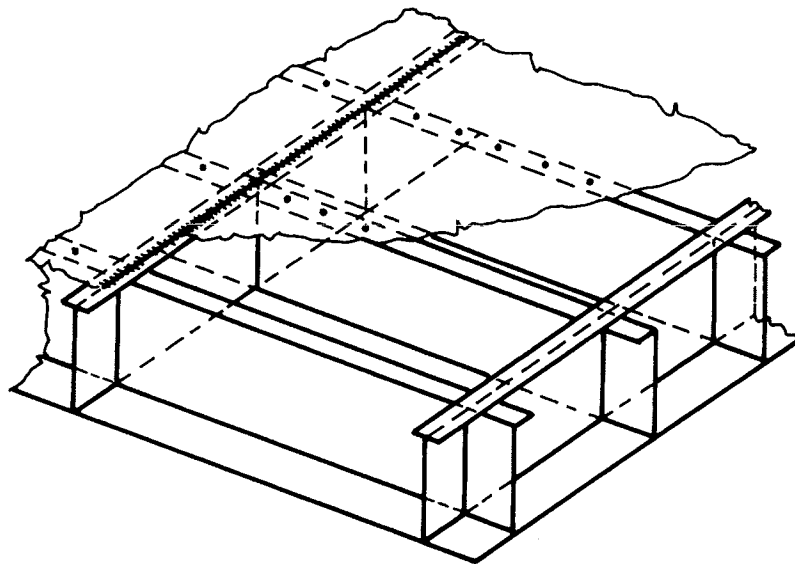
Cellular plate with a combination of fillet and arc-spot welds
